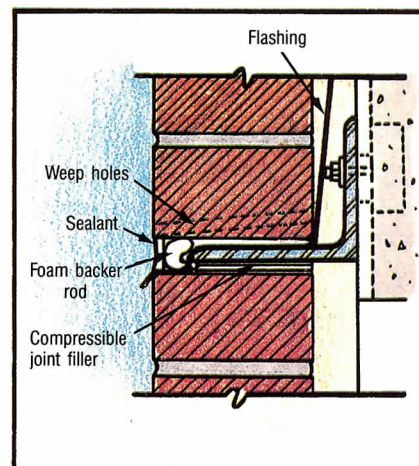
Horizontal expansion joints installed under relieving angles allow brick veneer to expand vertically and the concrete building frame to shrink and shorten.
